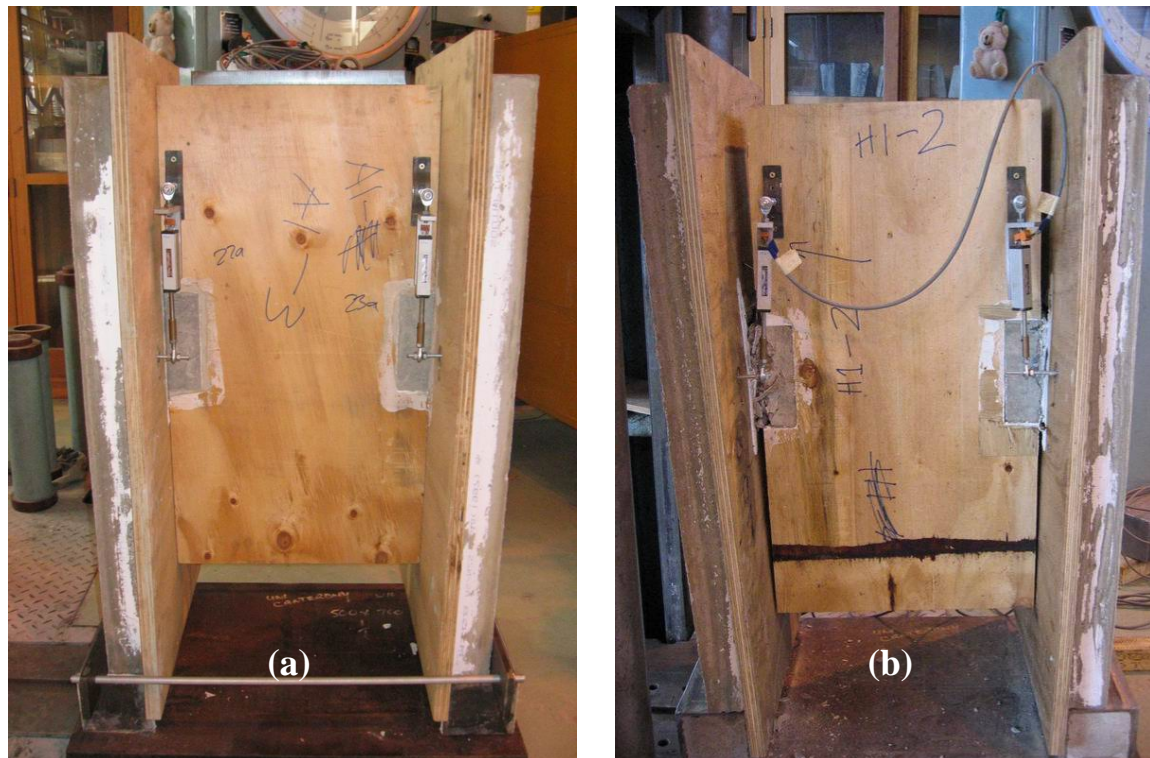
Symmetrical push-out test setup: (a) Specimen before test; and (b) Specimen after test with shear failure along concrete notch causing web-flange separation.
